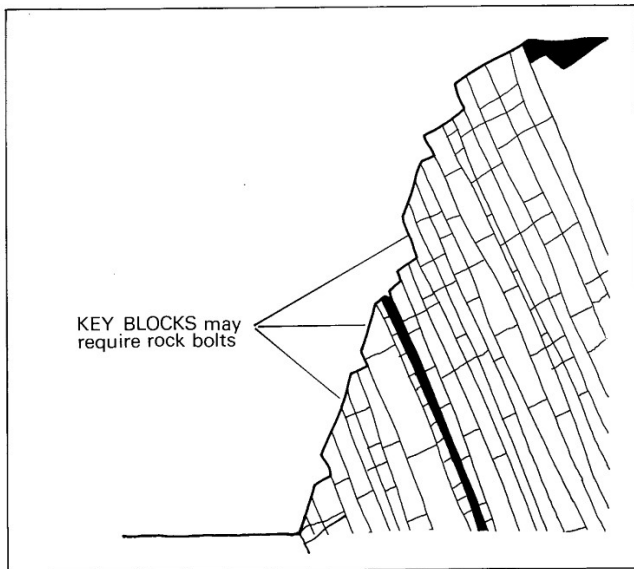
Pre-split excavation in rock mass prone to toppling failure
